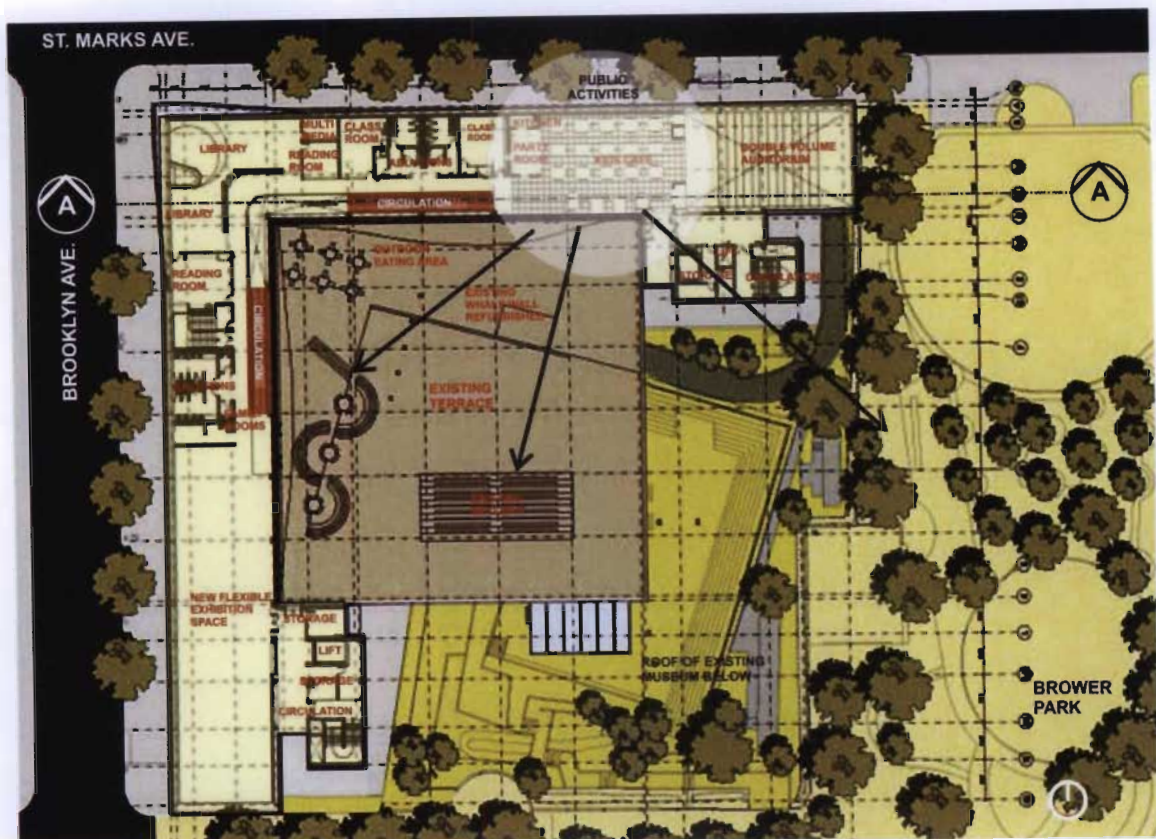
First floor plan, note the cafe is located on the first floor (Vinoly Architects, 2007).
